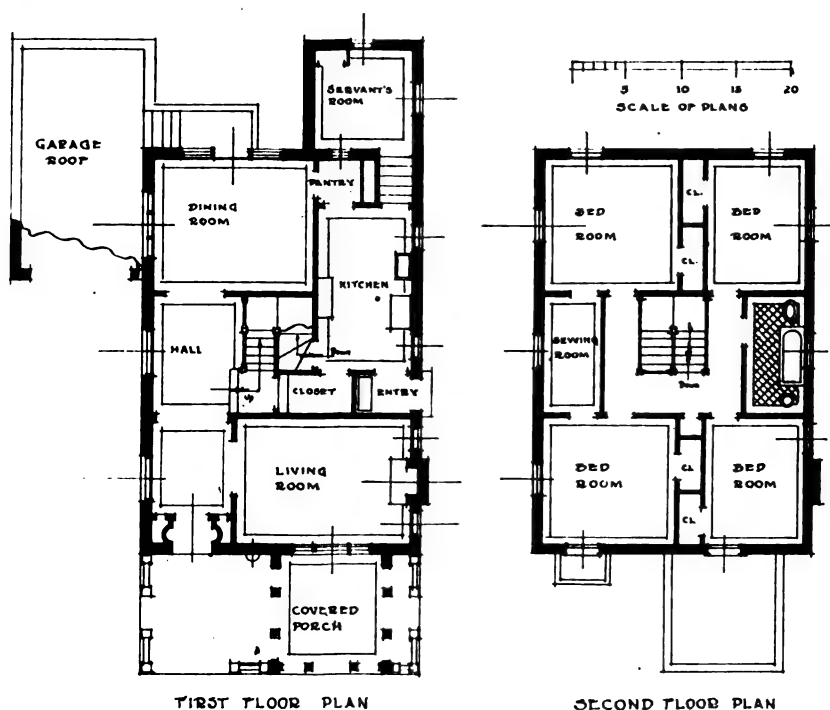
FLOOR PLANS, YONKERS CONCRETE STONE HOUSE
